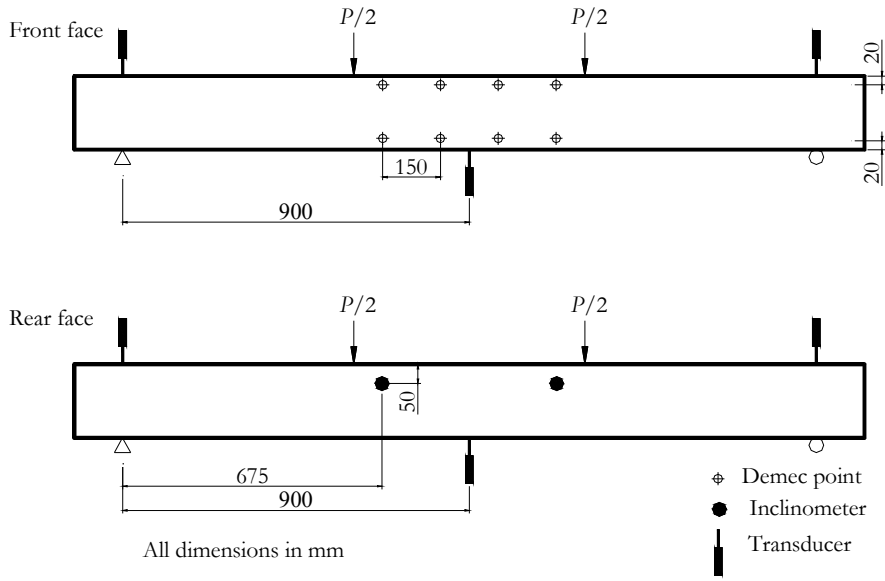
Instrumentation details for beam C2-212-D2-A.
